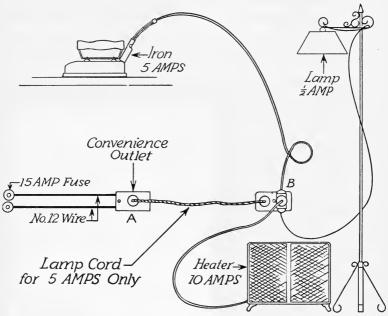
Improper use of extension cord should be avoided between outlets "A" and "B"
